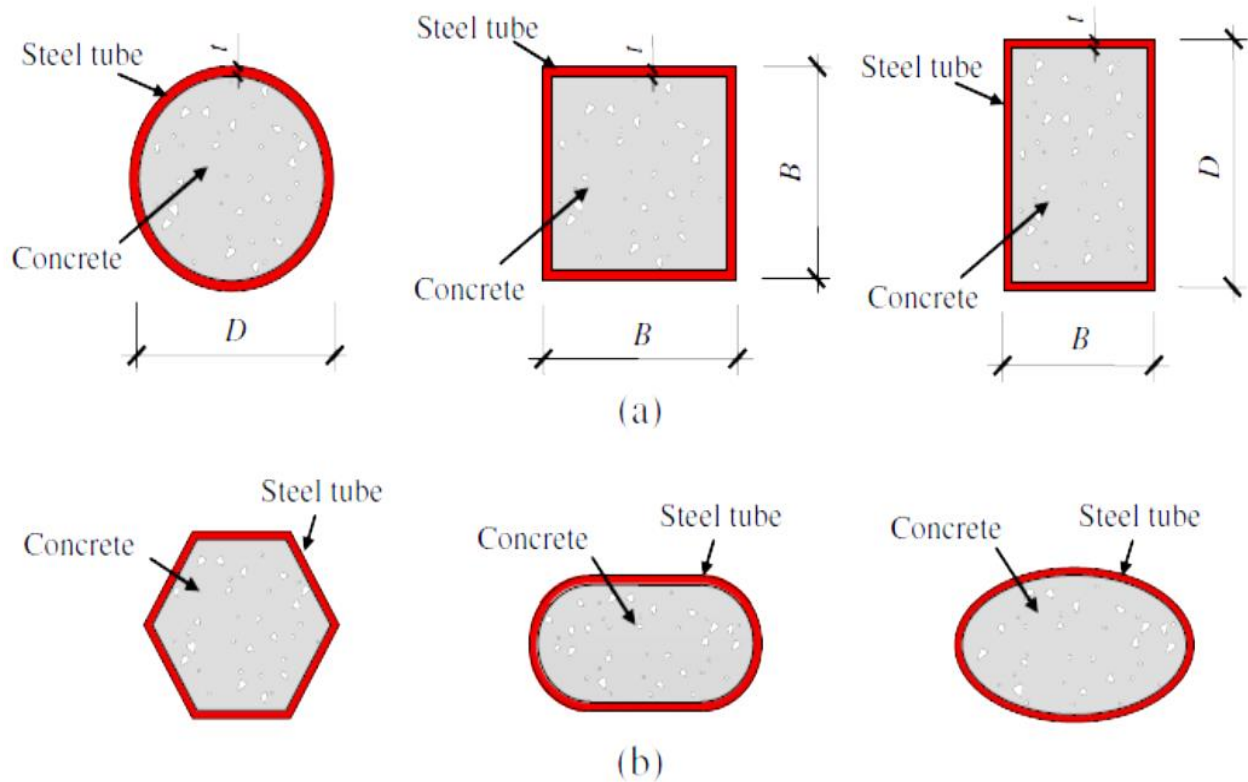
Typical CFST cross-sections (Ibanez et al., 2021)
